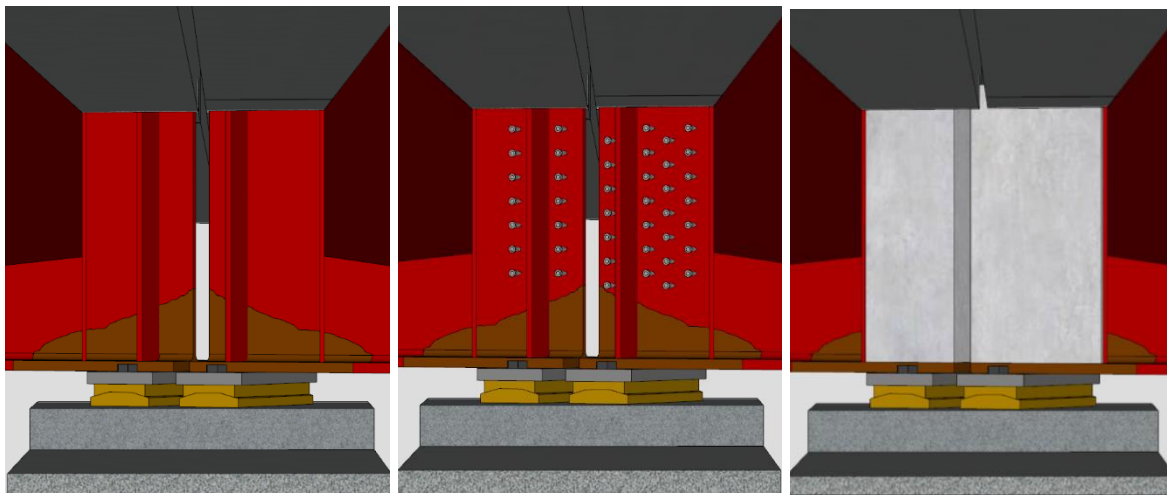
3D rendering of the proposed UHPC repair method -1) Girder End Corrosion, 2) Welded Shear Studs, & 3) UHPC repair panel
